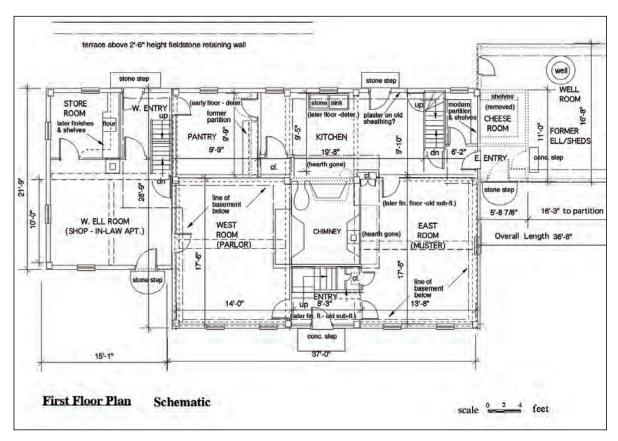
Architectural plan of the first floor of the Barrett Farm house including the no longer standing east ell (Detwiller 2007).
